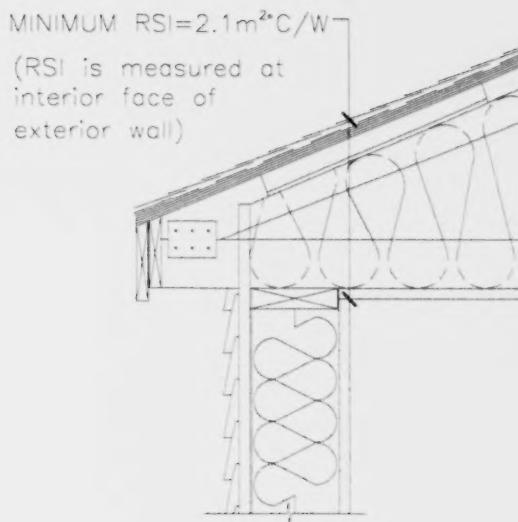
2 Reduction in Thermal Insulation due to Roof Slope and Required Ventilation
